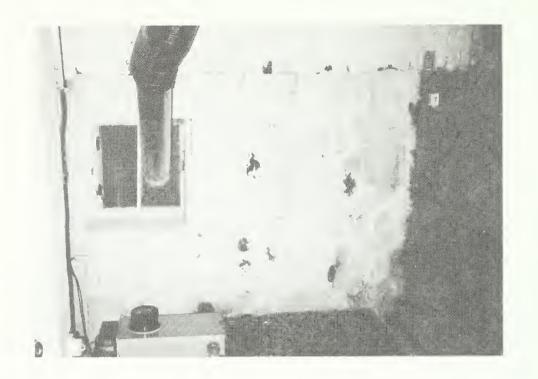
Cellar kitchen (Room 004), south wall, window W004.
